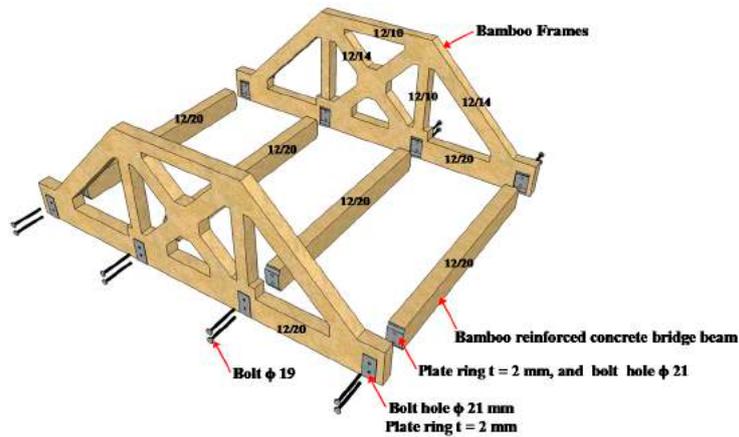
Model of the precast bridge made from bamboo reinforced concrete.
